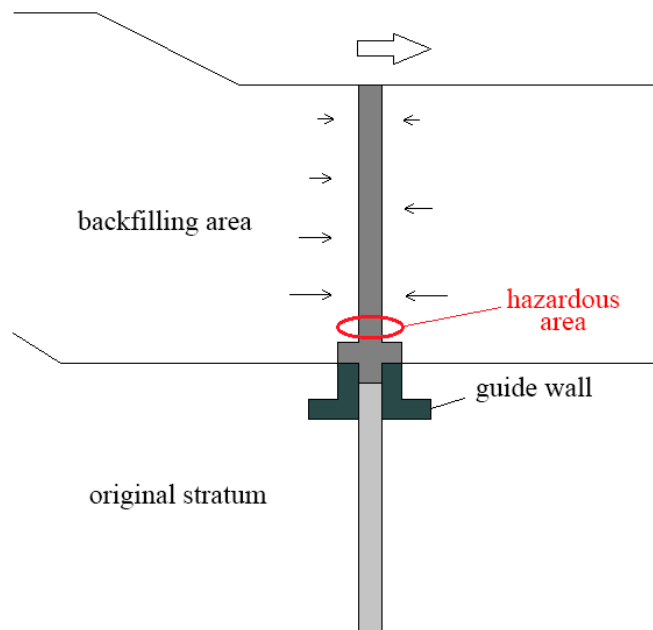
Schematic diagram of maximum stress area of cut-off wall.
